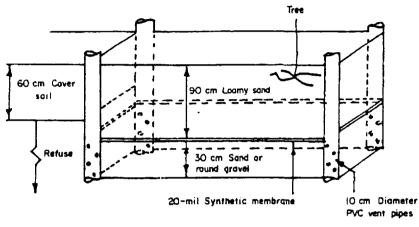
Trench barrier system for small planters. Vent pipes should be spaced no more than 2 m apart.
